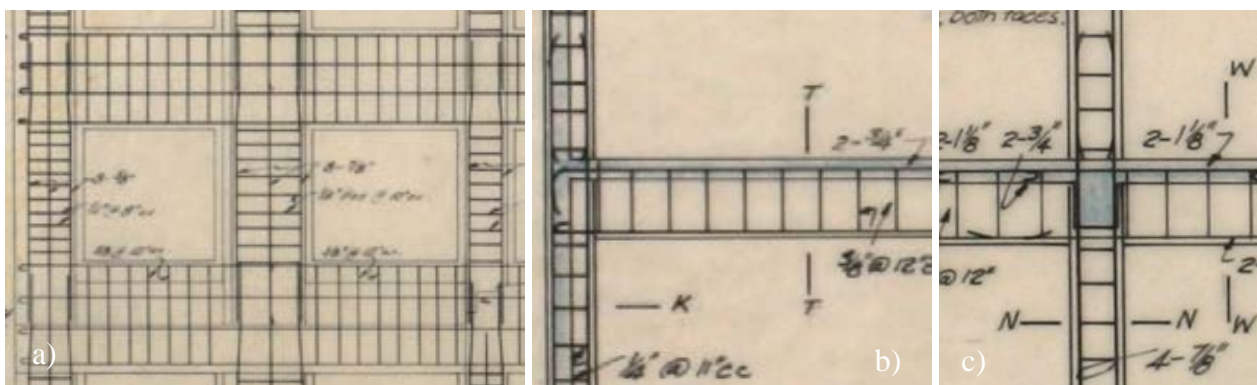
Case study building A: a) Reinforcing details of the front elevation perforated wall; b) Reinforcing details of the exterior beam-column joint; c) Reinforcing details of the interior beam-column joint
